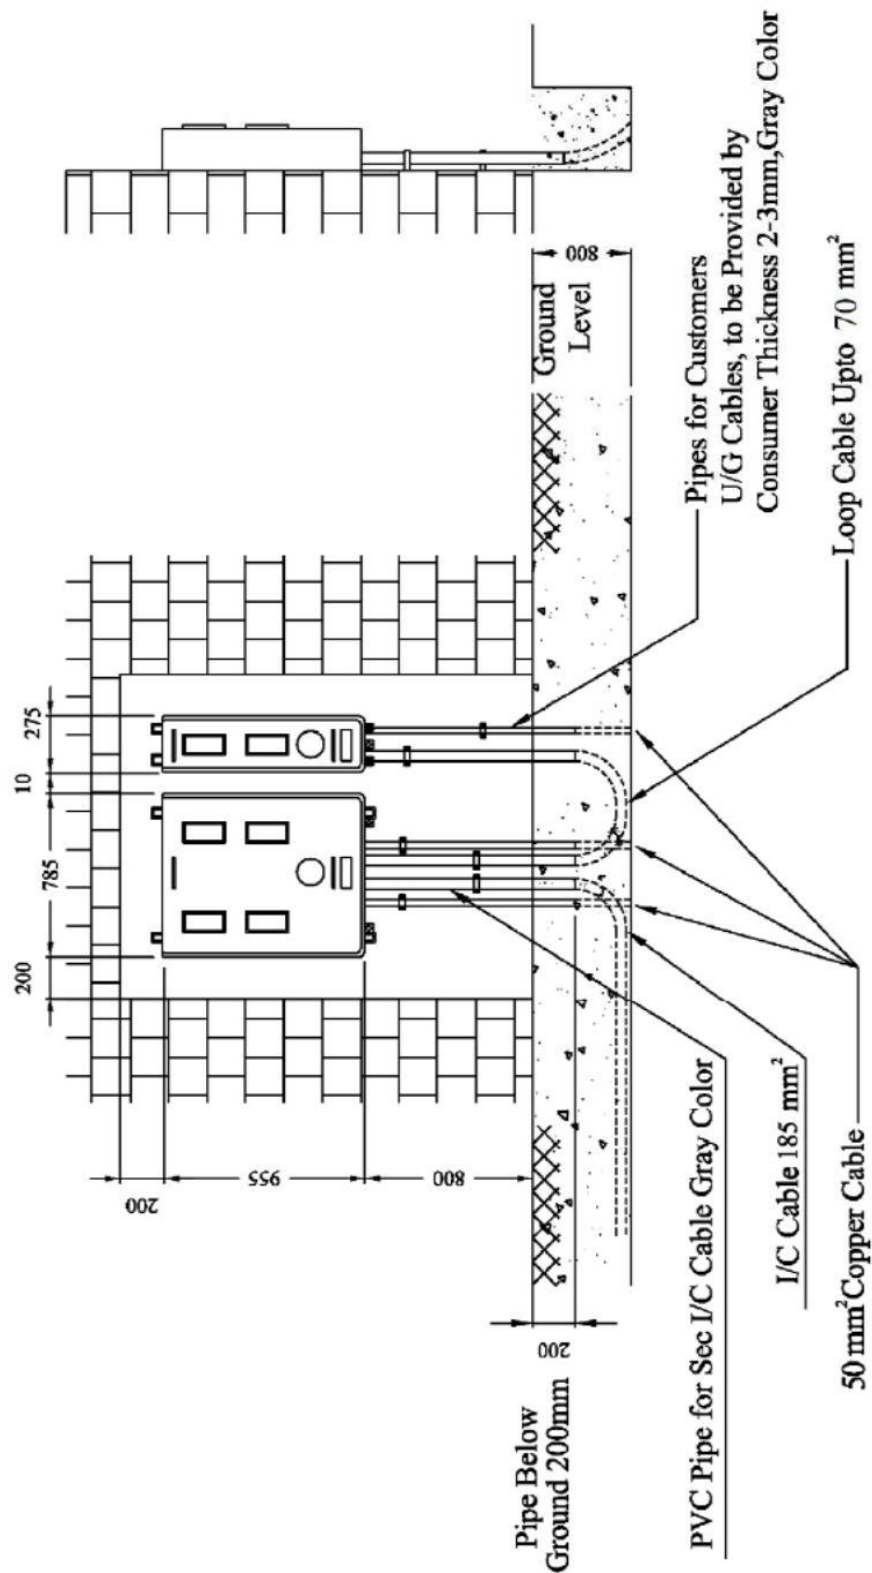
Installation of 3 Direct KWH Meters on the Front Wall
